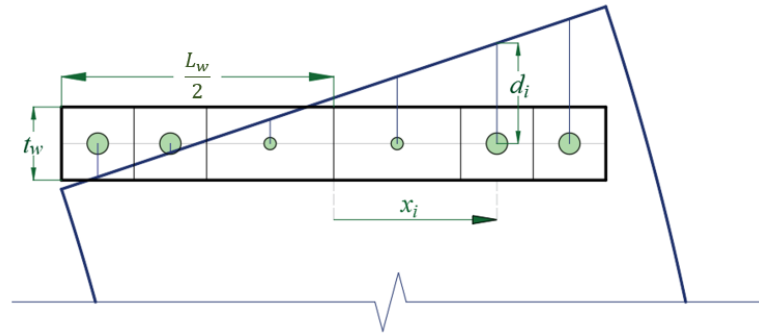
Fiber-discretized cross section of a deformed shear wall
